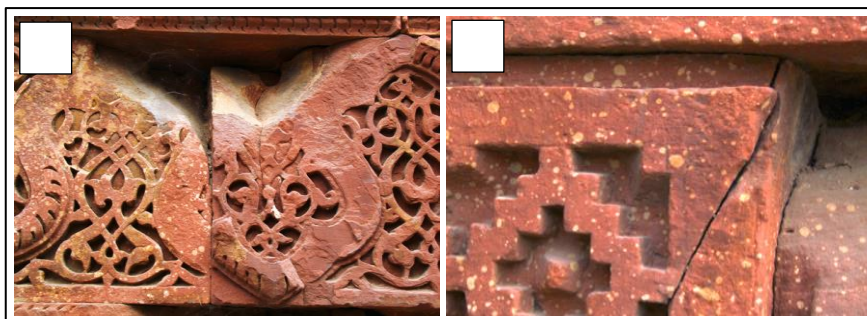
Bursting (a) and fracturing of sandstone (b).
